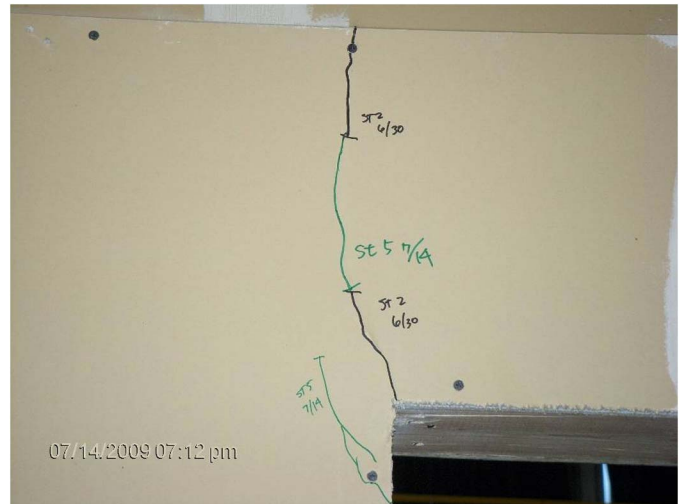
Crack on Wall A3, Story 4 (over window opening) after Seismic Test 5
